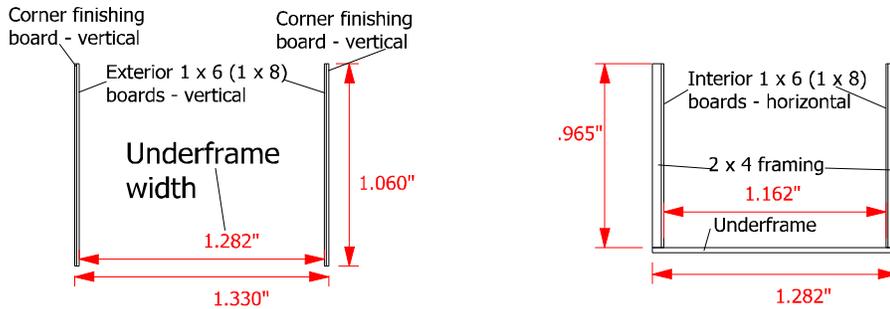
Drovers Caboose end view - dimensions expressed in 3 decimal places
